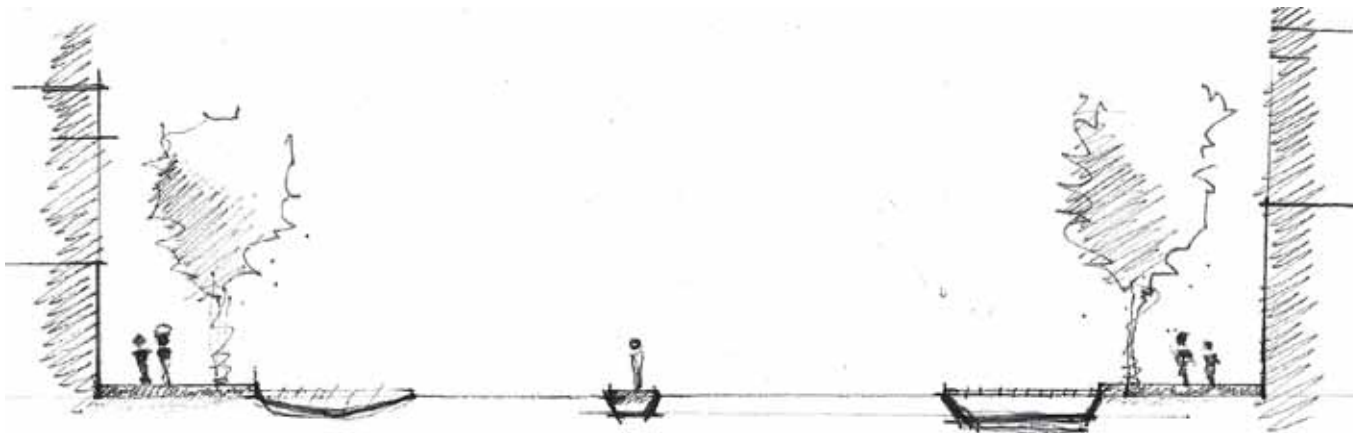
PROPOSED STREET SECTION OF AVENIDA 25 DE SETEMBRO (AUTHOR, 2011)
